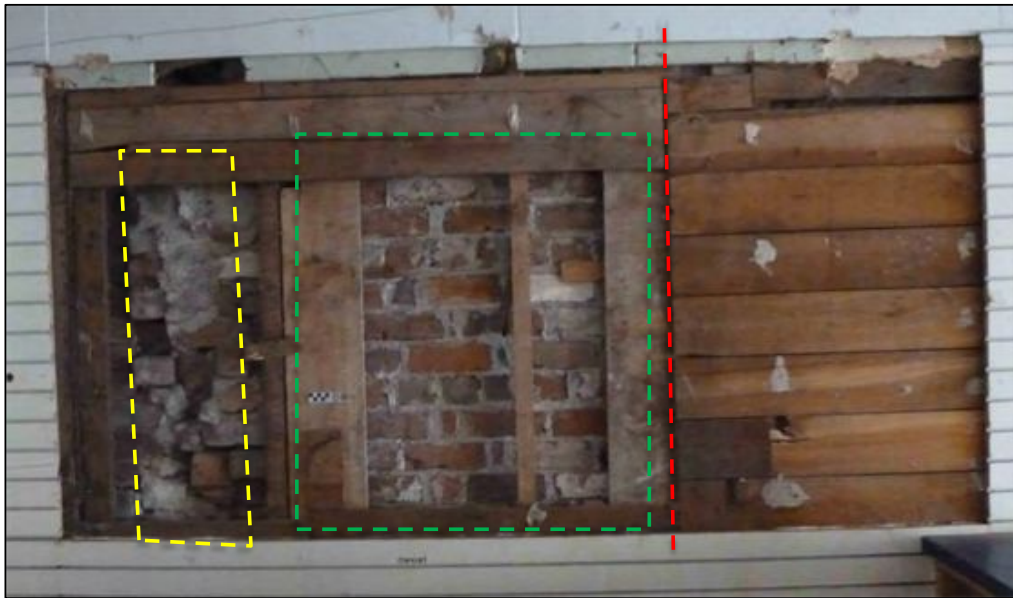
Photo of sample area 23B on east wall showing narrow sarking boards (right of red line), wider sarking boards (left of red line, mostly removed), remnant of removed brick wall (yellow outline), and bricked up doorway behind timber framing (green outline).
